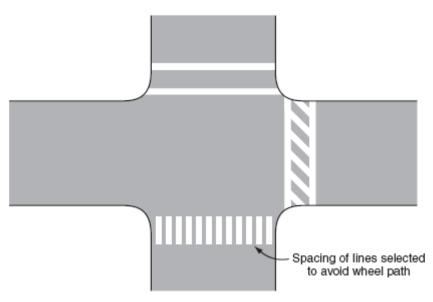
Examples of Crosswalk Markings (Adapted from MUTCD Figure 3B-16)
